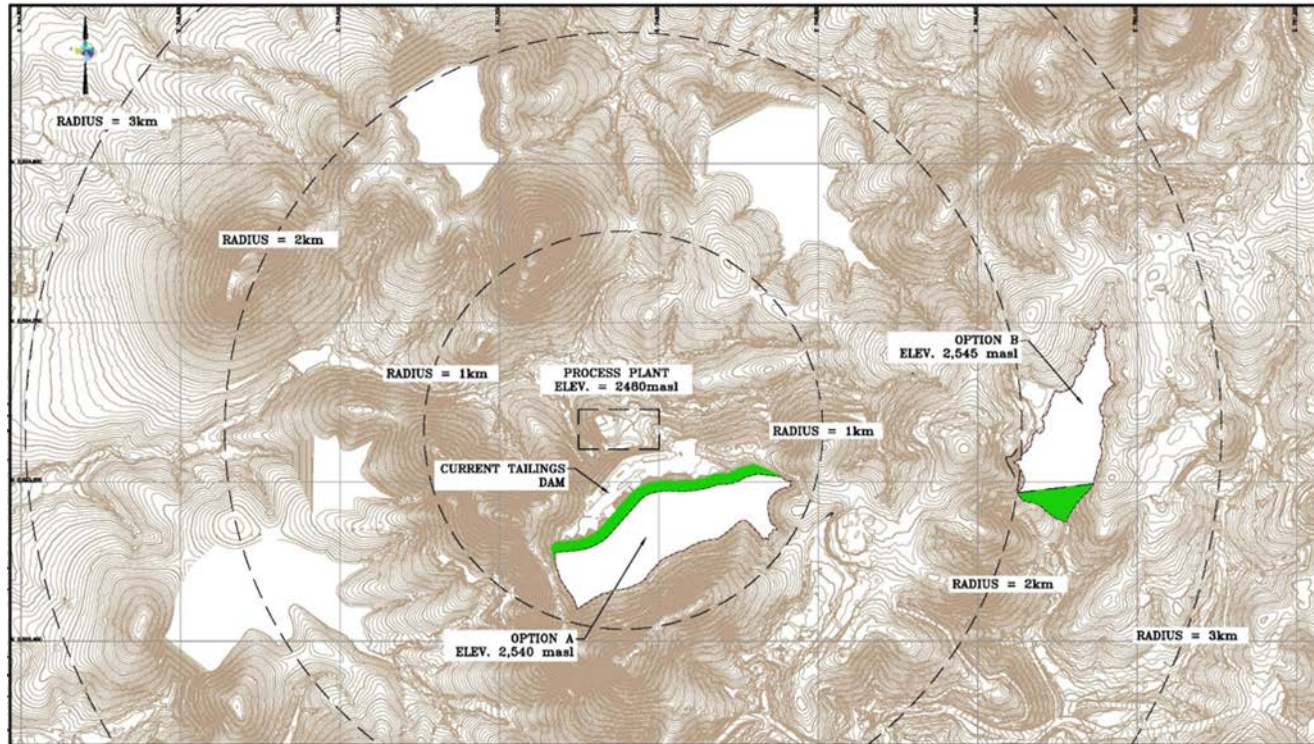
Location of potential sites for the construction of a Filtered Tailings facility (Wood 2019)
